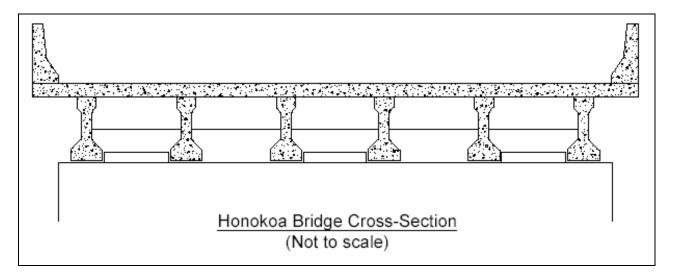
Cross-section through Honokoa Bridge. (Diagram by Ian Robertson)
